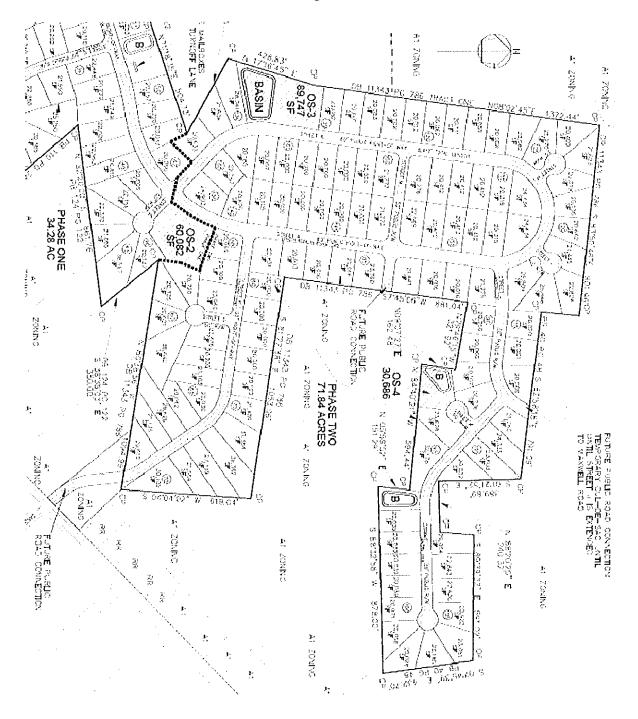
EXHIBIT "A" OF THE CONDITIONS OF APPROVAL CONDITIONAL USE SITE PLAN
